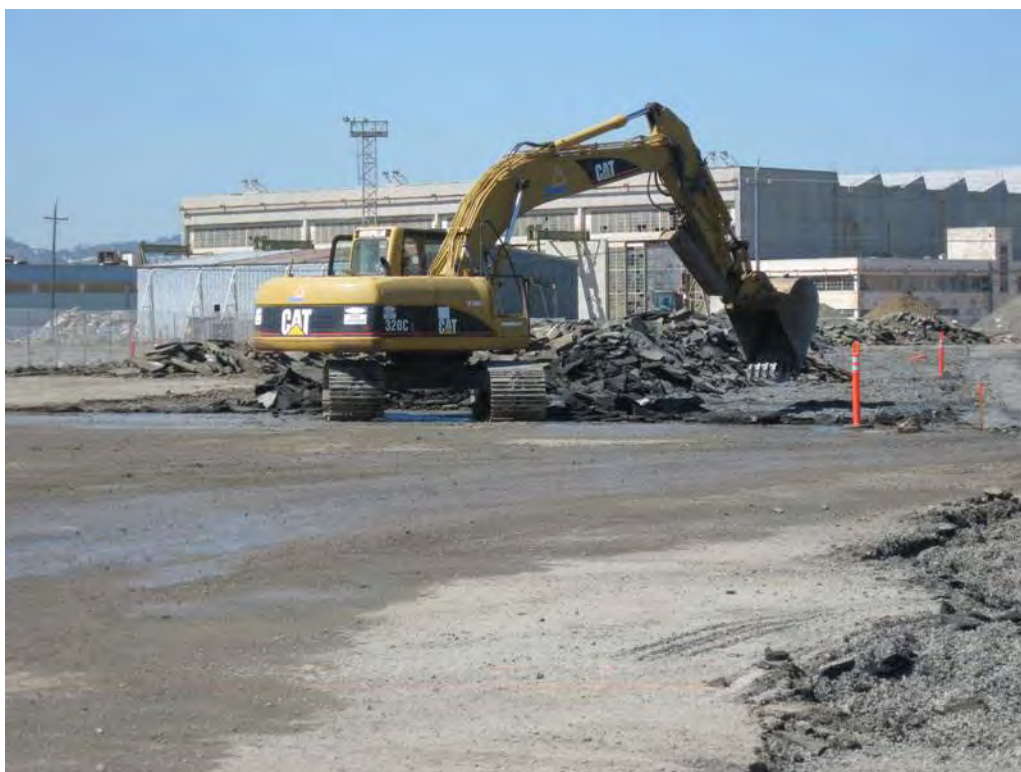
Excavation along trench segment 06-D28-32-2E in WA 28—September 19, 2011
